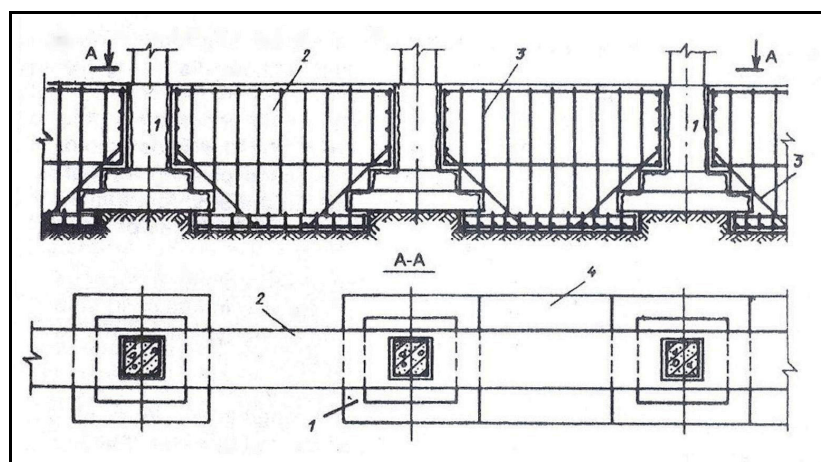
Conversion of columnar foundation to strip foundation* [1]
